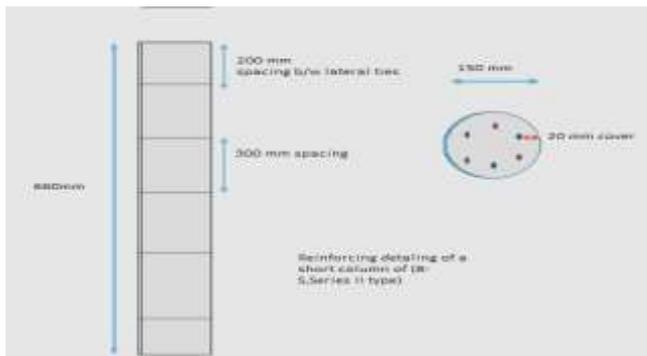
Showing Reinforcing Detailing Of Short Columns Partial Replacement of GFRP Rebars
